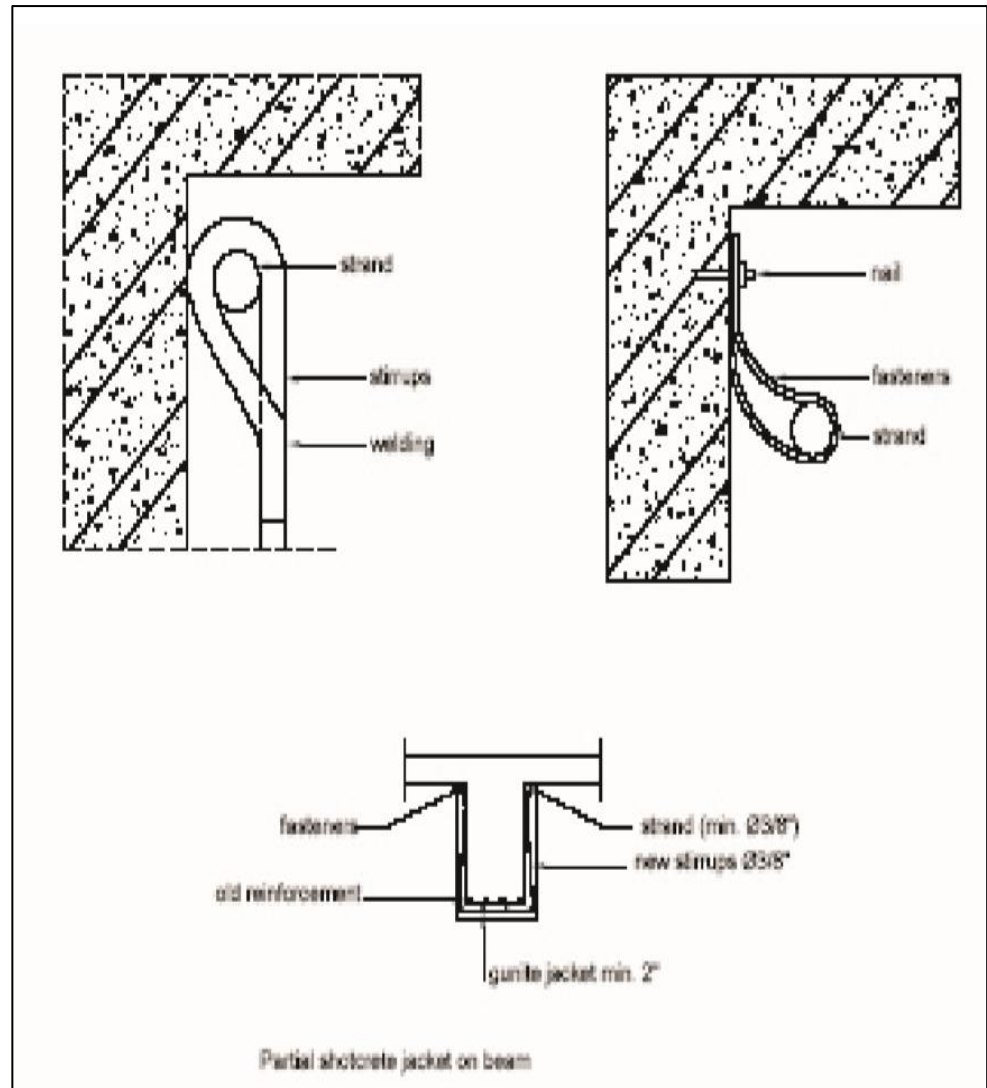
Strengthening of concrete slab-beam system by three-sided jacketing
